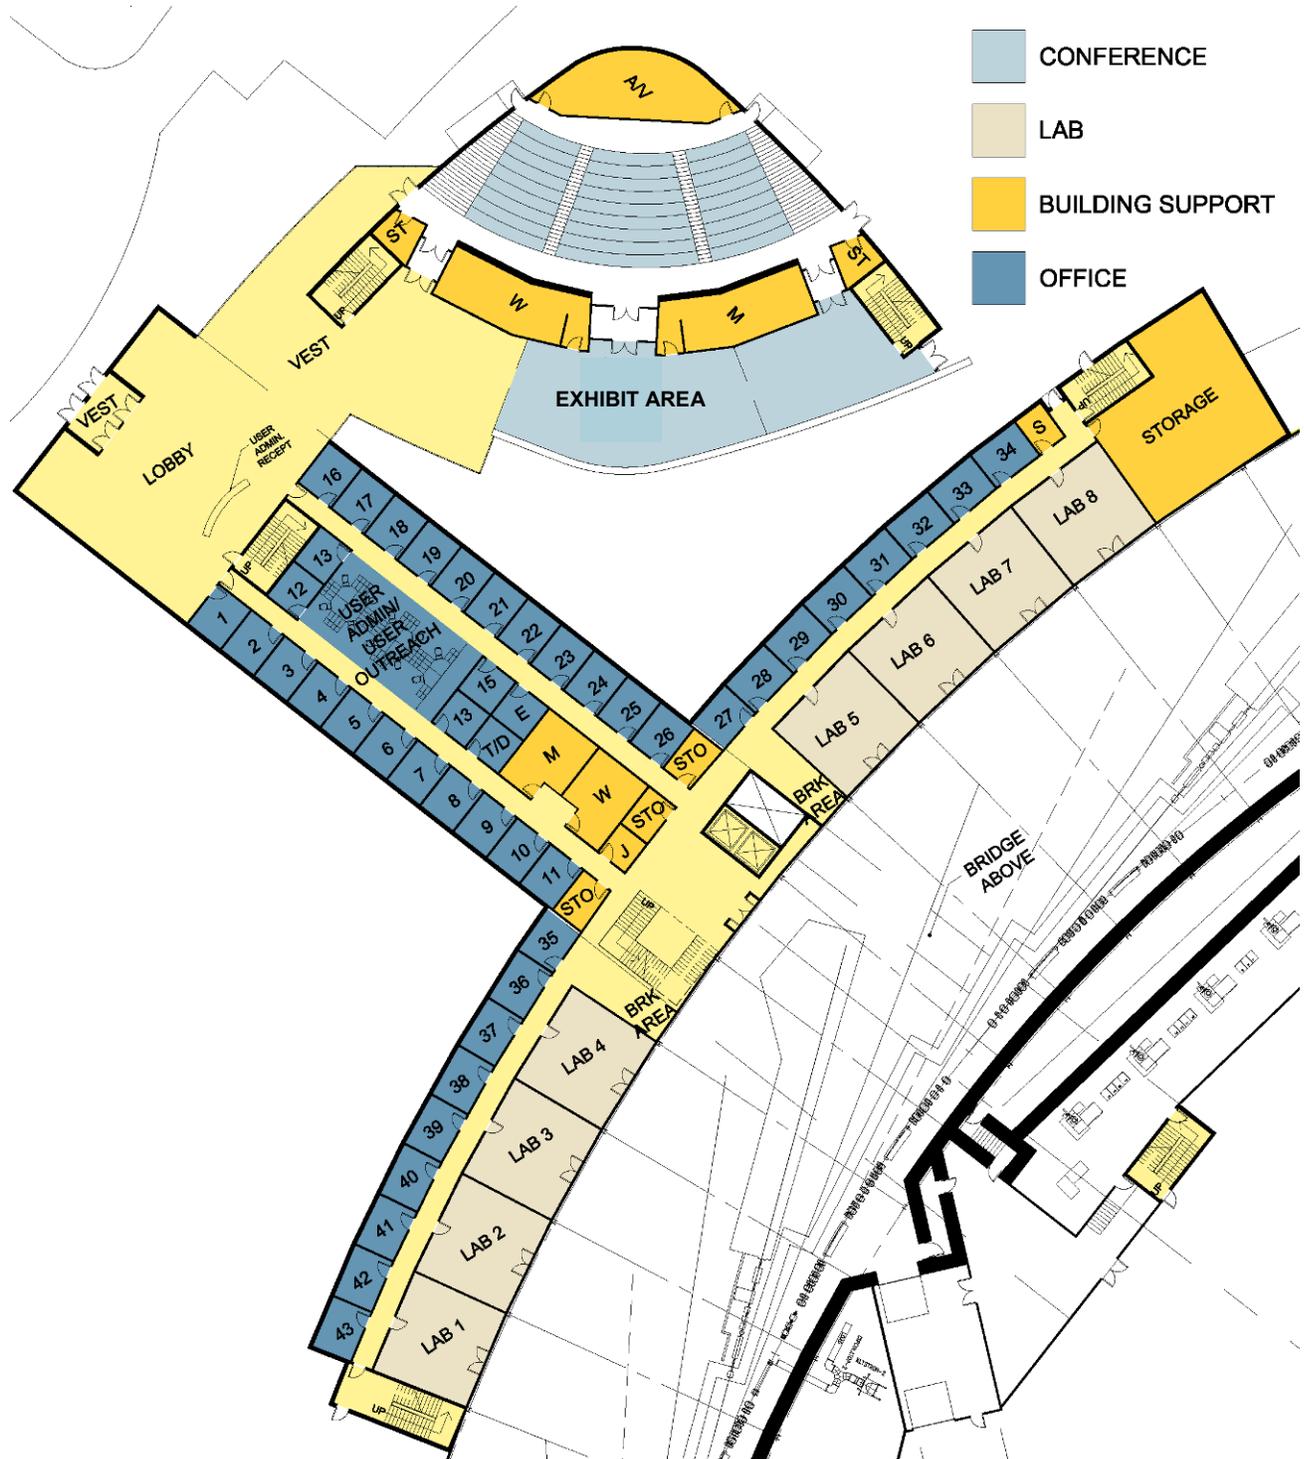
CLOB 1<sup>st</sup> Floor Plan.
